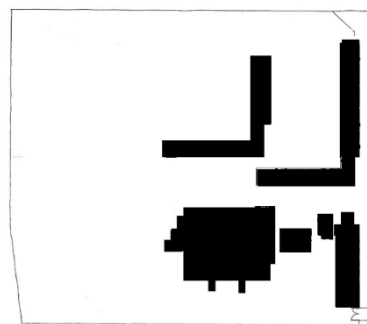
Plan indicating footprint at Usasazo Secondary (Adapted by author, from Wolff Architects (2024:online)
